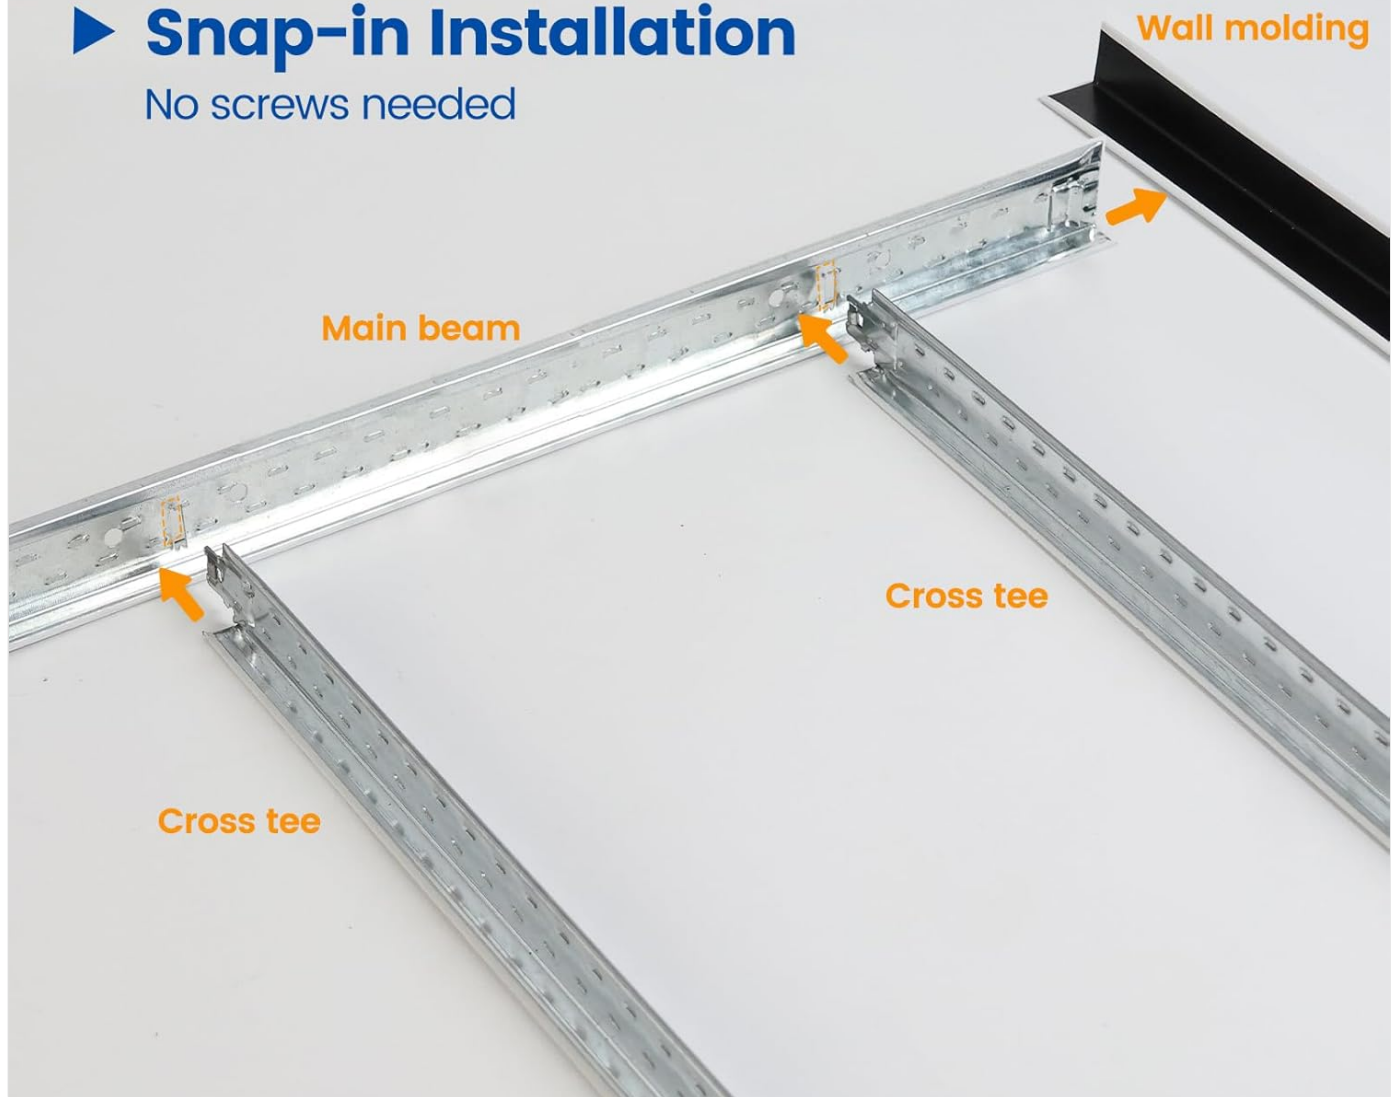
Illustration of the snap-in installation process, showing the main beam, cross tees, and wall molding.
